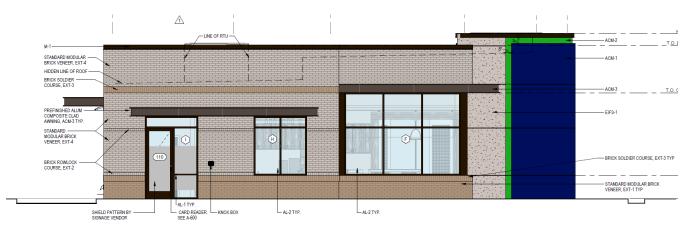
Montreal Road Elevation with 32.7% Fenestration.
